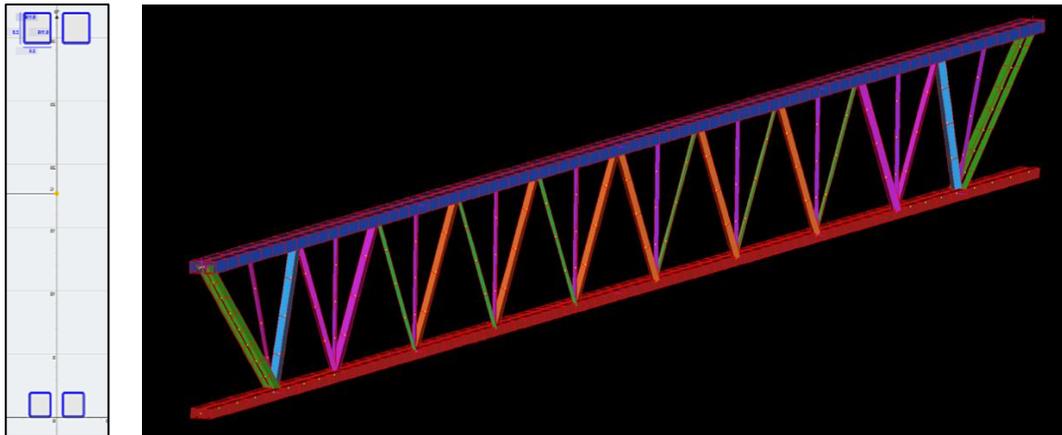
Hybrid 2 Design chord cross-section and joist rendering, respectively
